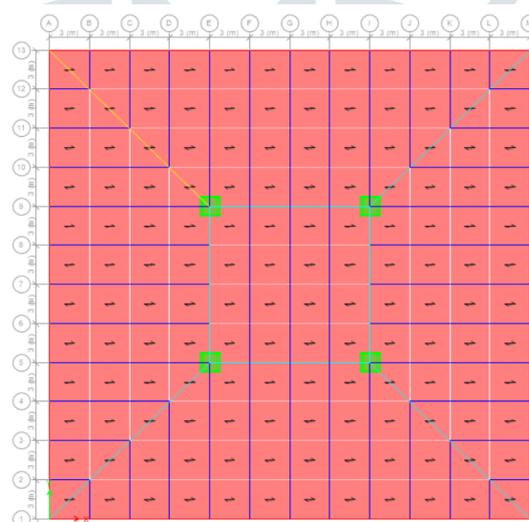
Typical Floor Plan of Diagrid Steel Structure
